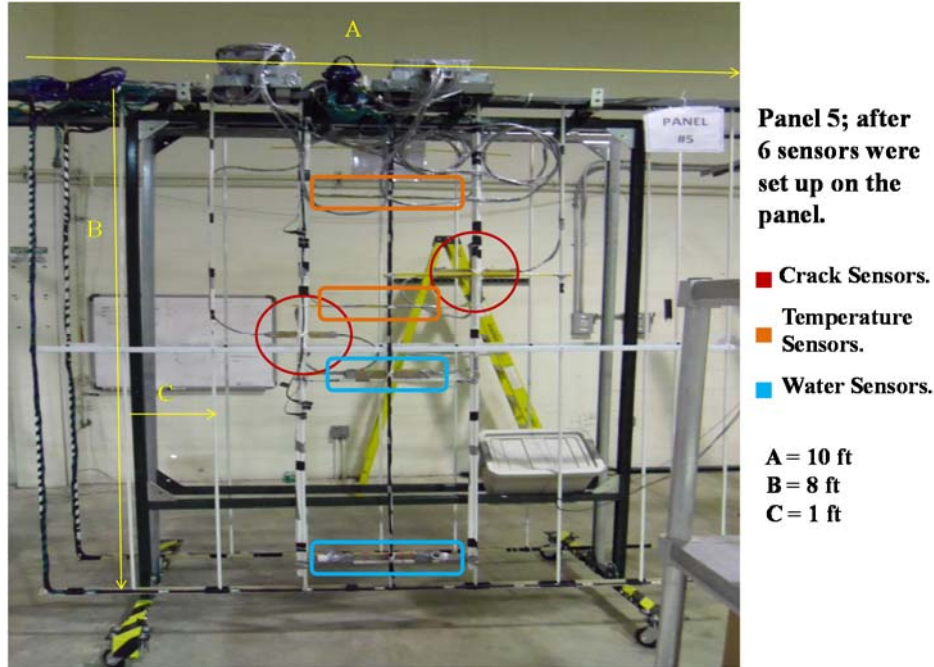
The panel FLRD sensors installed on to be embedded into the concrete cube.
